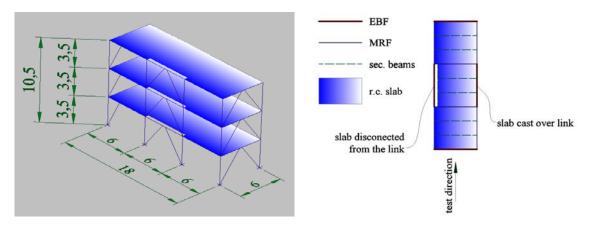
General view and plan layout of the test structure (measures in m) (Source: D. Dubina)
